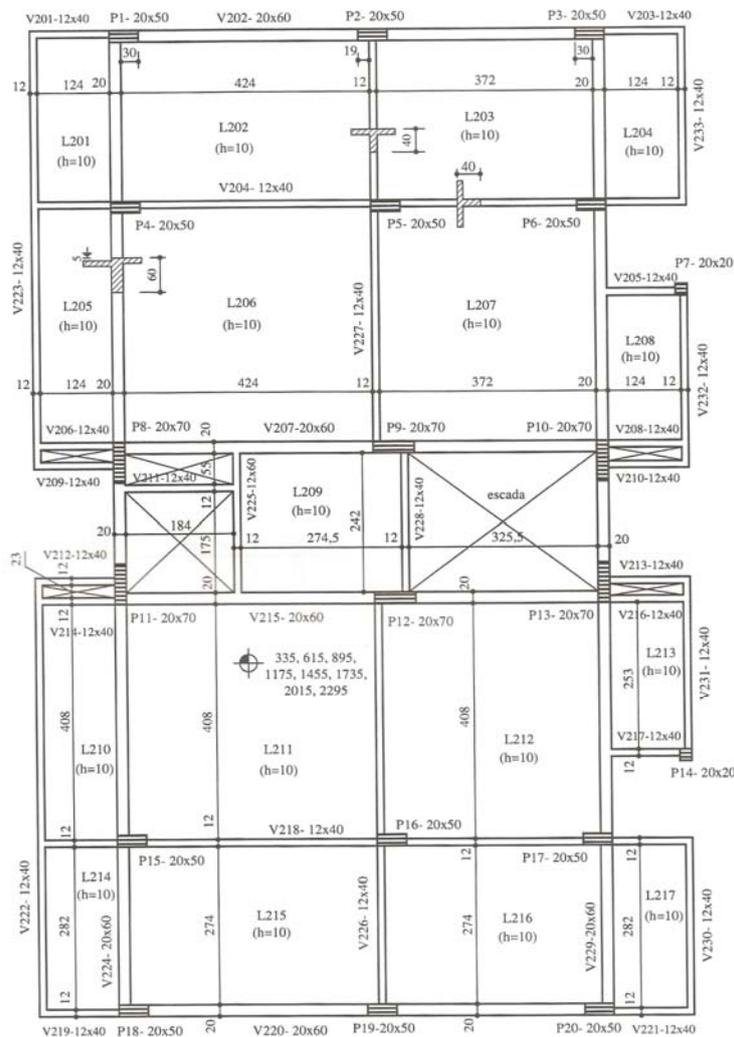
Formwork for typical floors with 33 beams (dimensions in cm)
